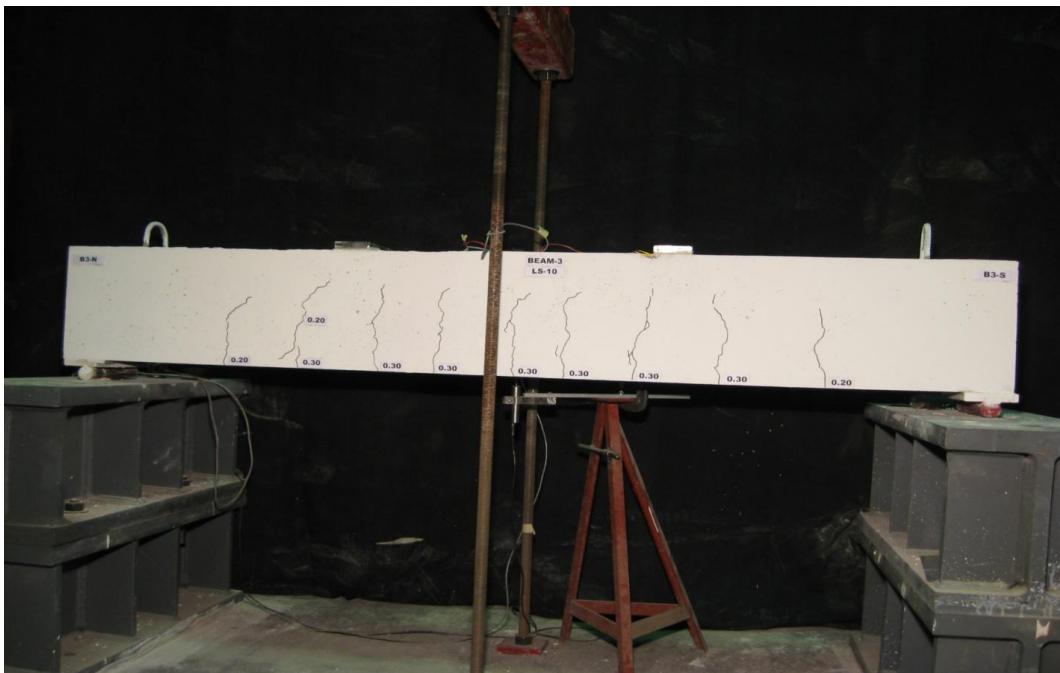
Cracking pattern for beam 3 at a load of 88.996 kN (B3- LS10 )
